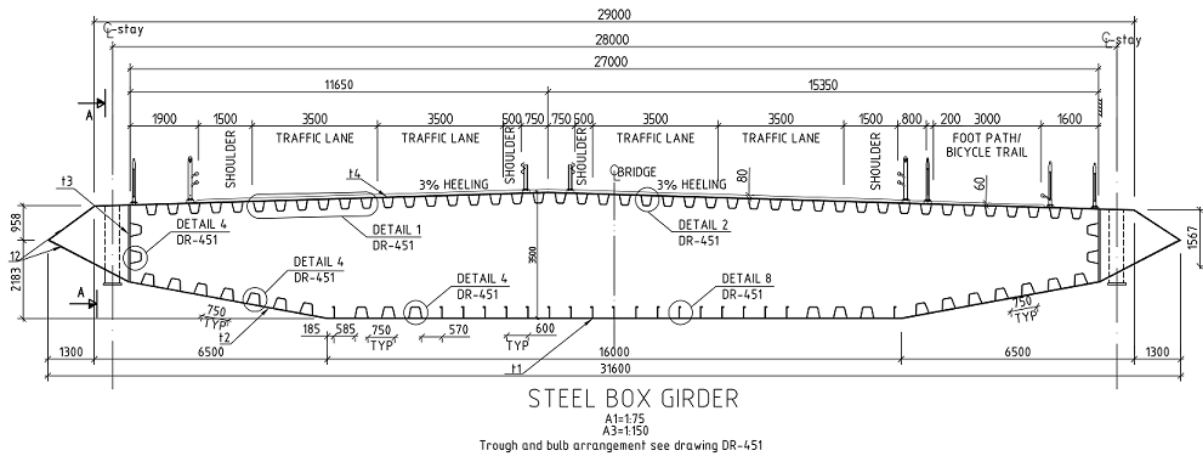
Steel bridge girder – cross section, longitudinal steel
